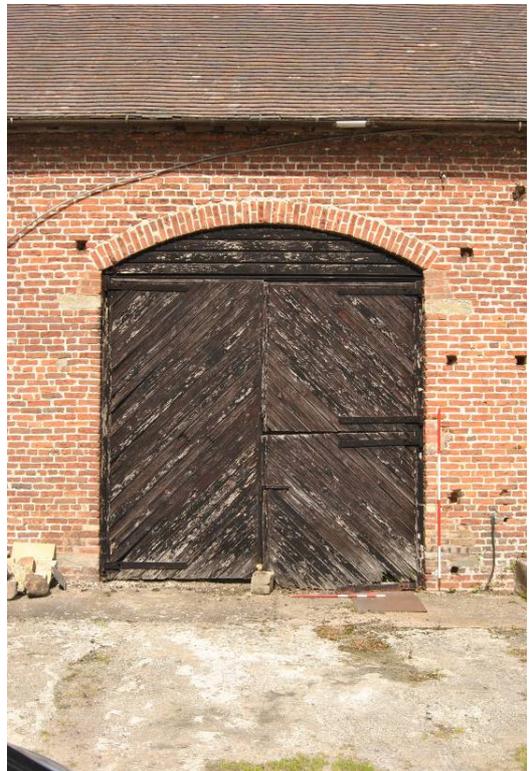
Barn B, threshing door, west elevation, Bay 3.
